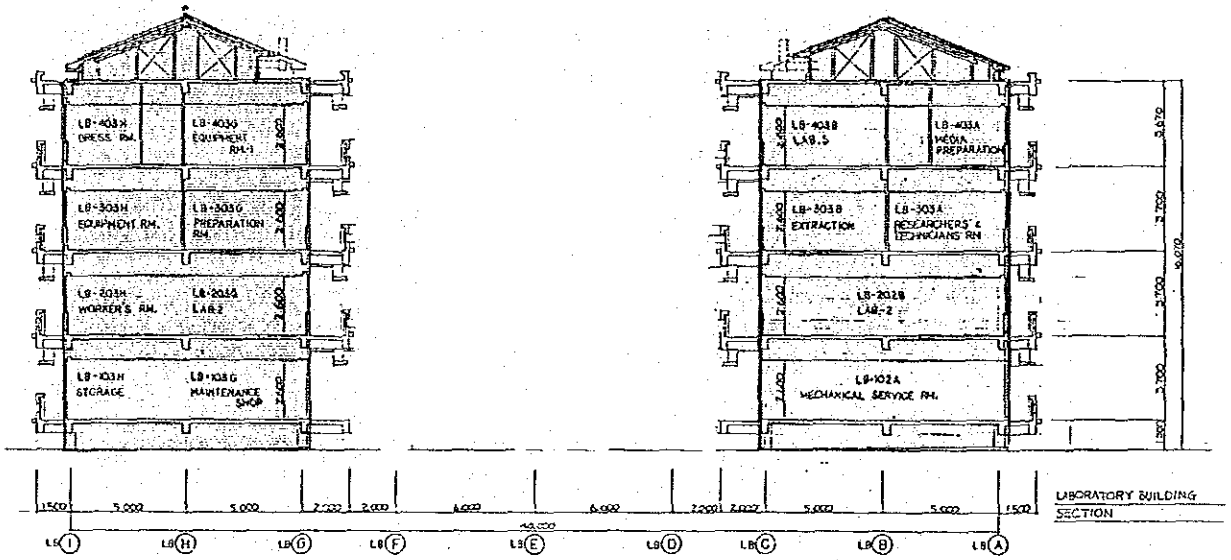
SECTION OF LABORATORY BUILDING
